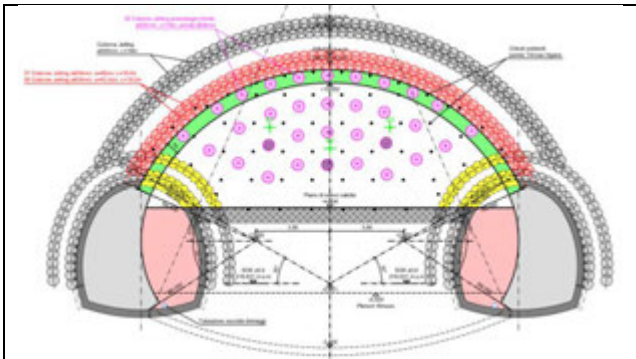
reinforced horizontal jet grouting for tunnel face stability
